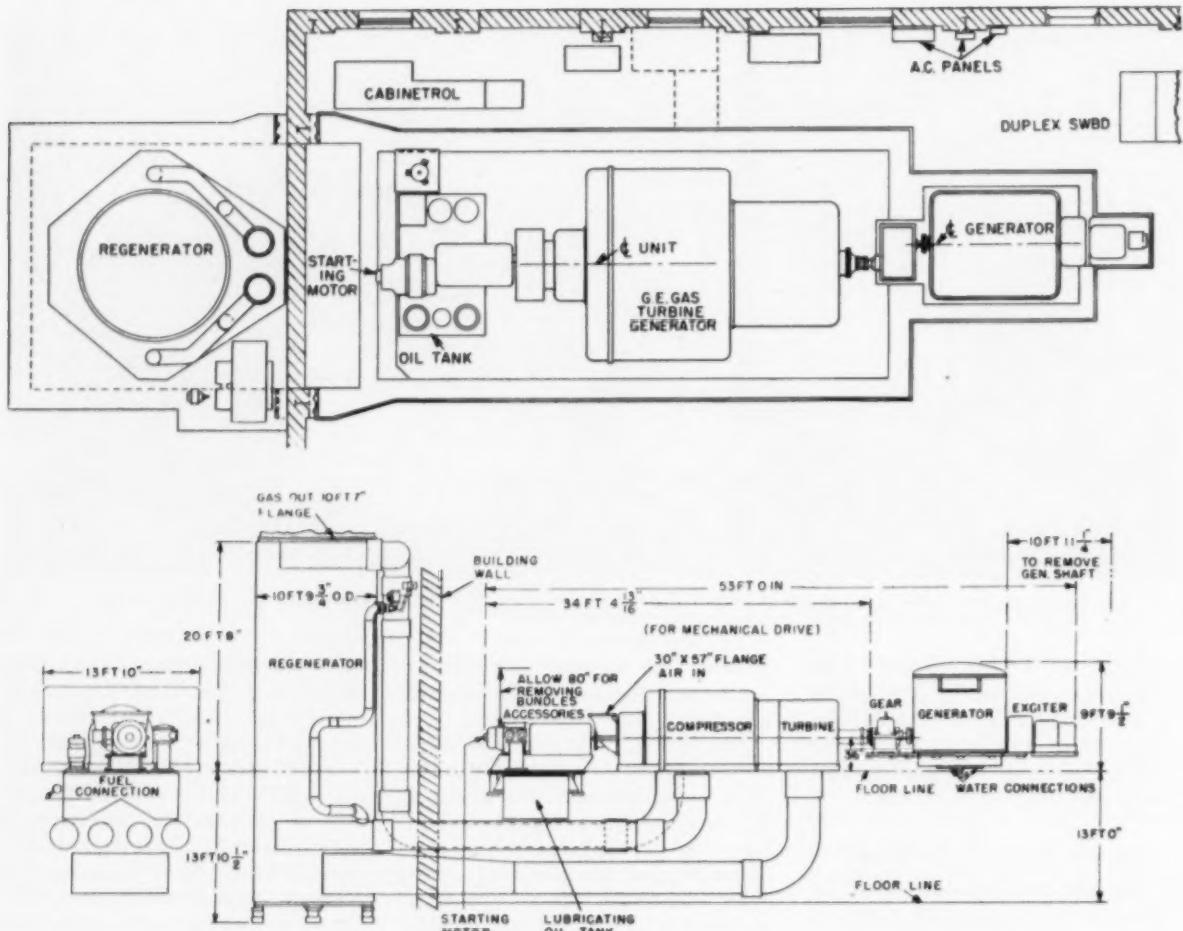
The upper drawing shows the arrangement of equipment in the Dixon Street Generating Station.
